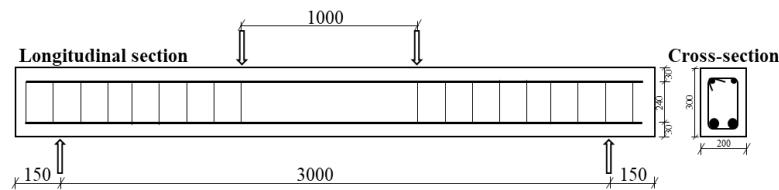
Reinforcement details of ISO30-I beam ([Benmokrane et al. \(1995\)](#))
